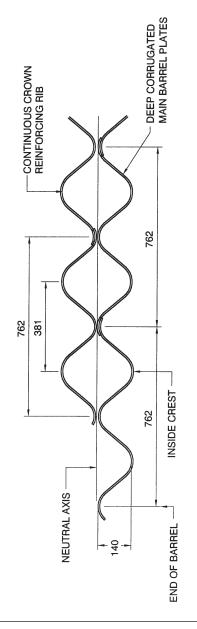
Reinforcing rib for deep corrugated structural plate Type I.
